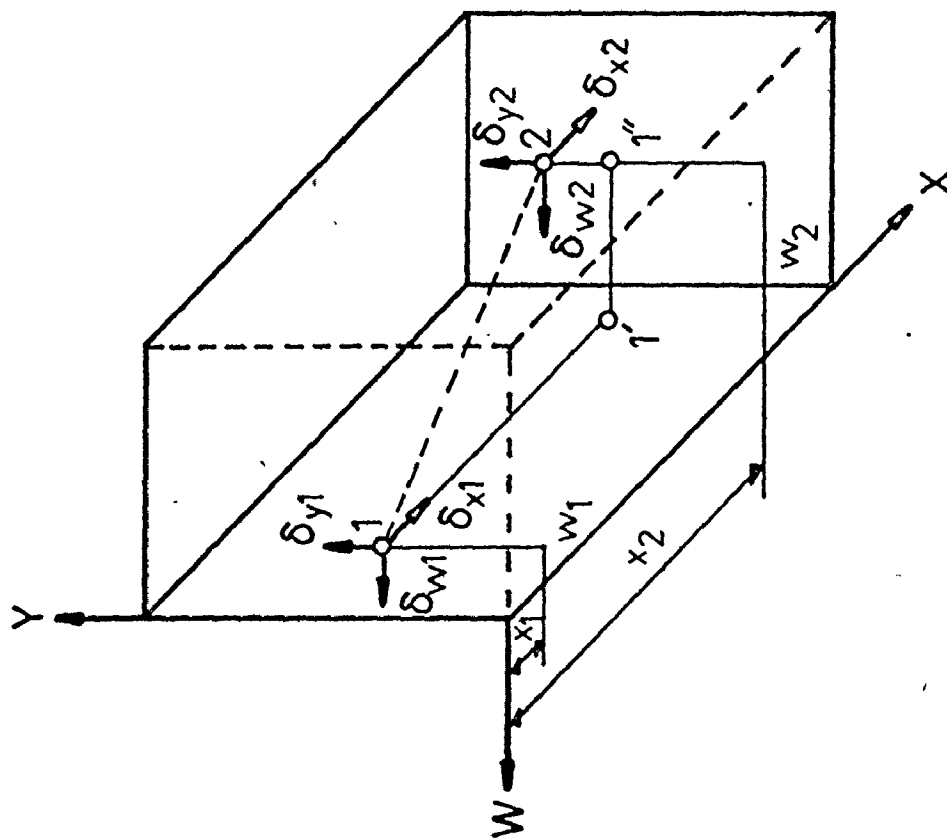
Tolerances in a Three Dimensional Zone
